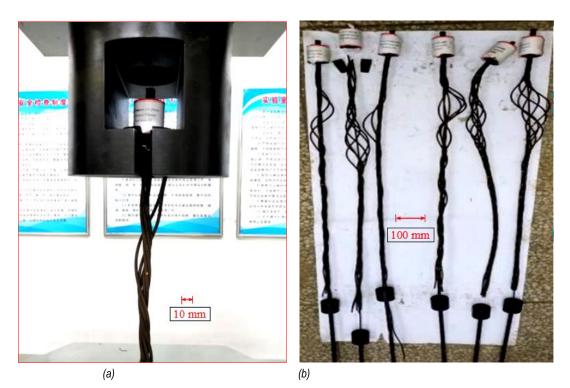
Failure forms of anchor cable. (a) Single anchor cable; (b) Two groups of anchor cables.
